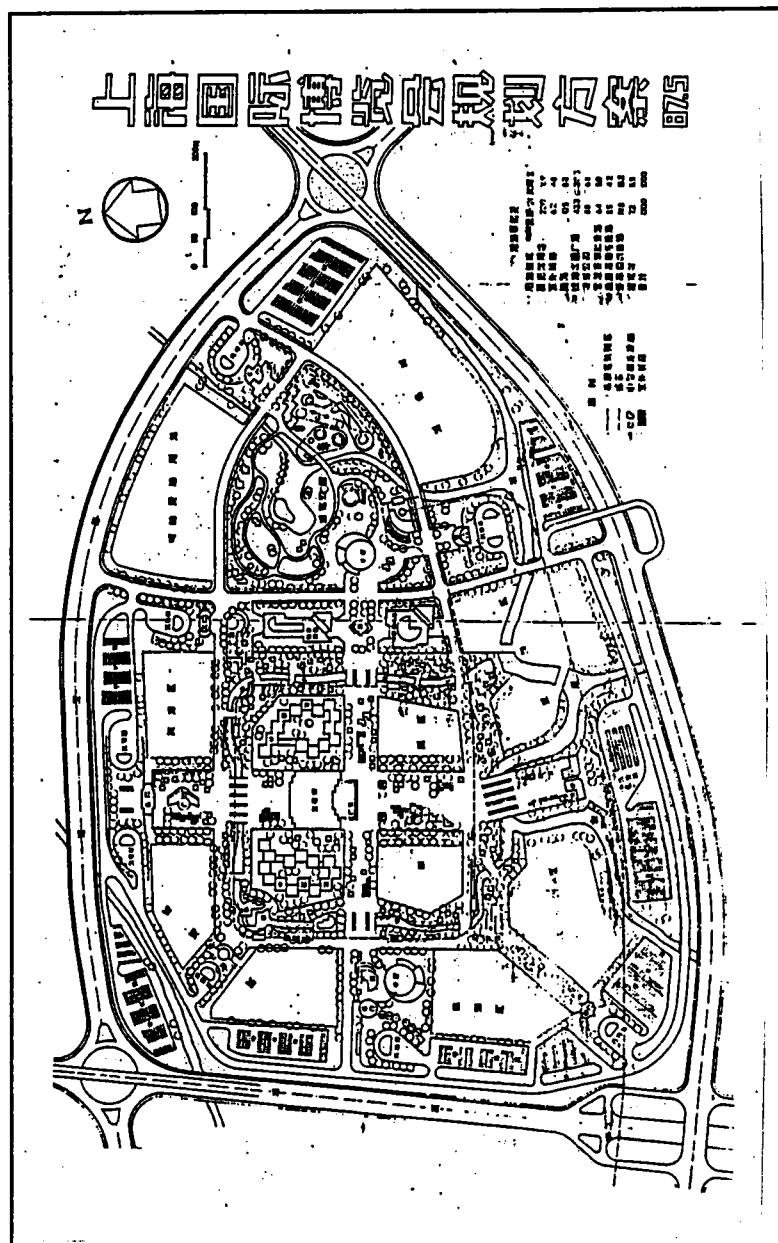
Concept Plan of Proposed World Fair in Pu Dong.
